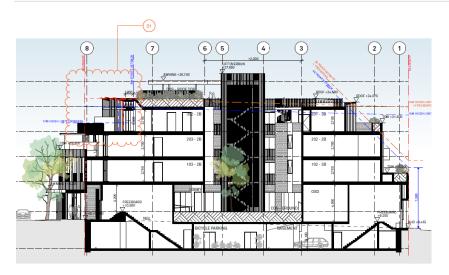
Extract of Section BB in Drawing No. A-DA-310-002
